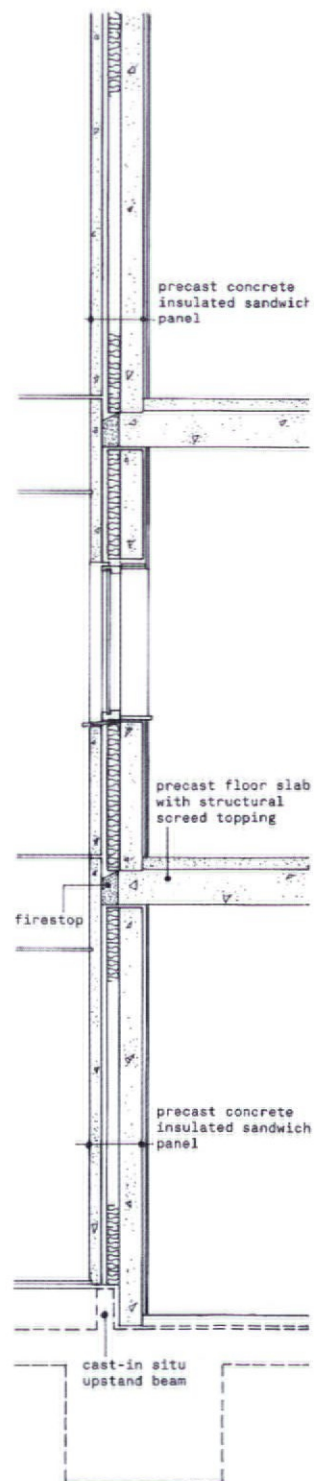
DETAIL OF PANEL-TO-FLOOR SLAB CONNECTION
